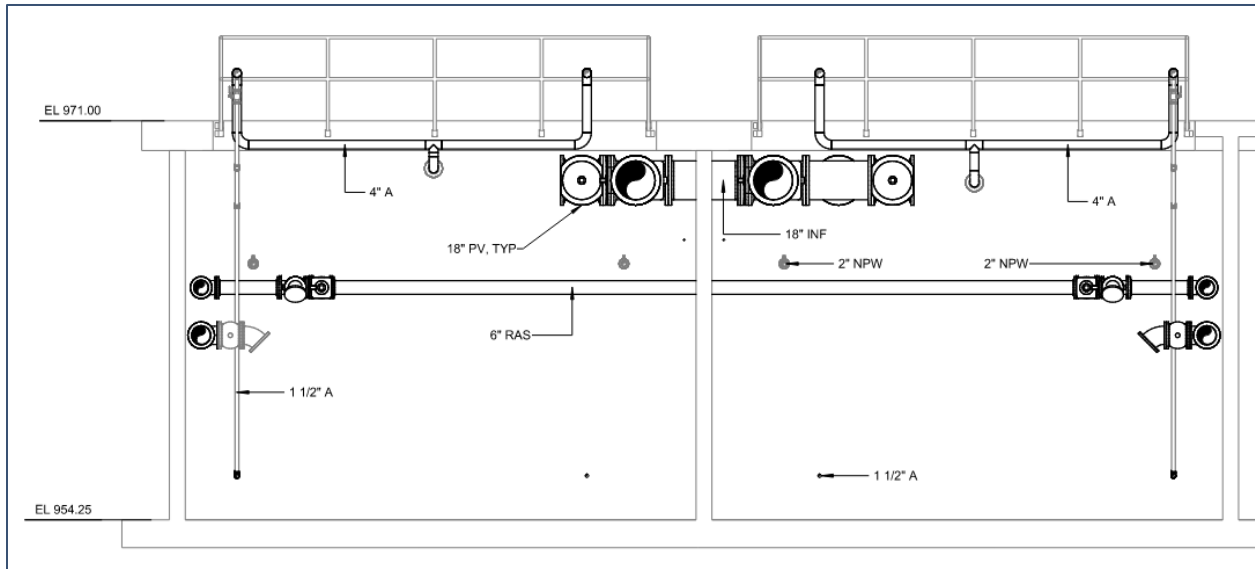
Proposed Reconfiguration of RAS Pipe
